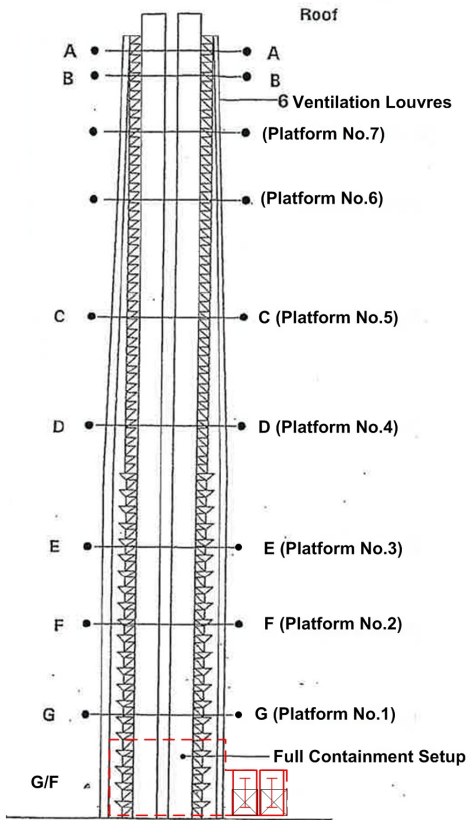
Layout Plan of Asbestos Abatement Work in Incineration Plant - Asbestos Cement Pipe
